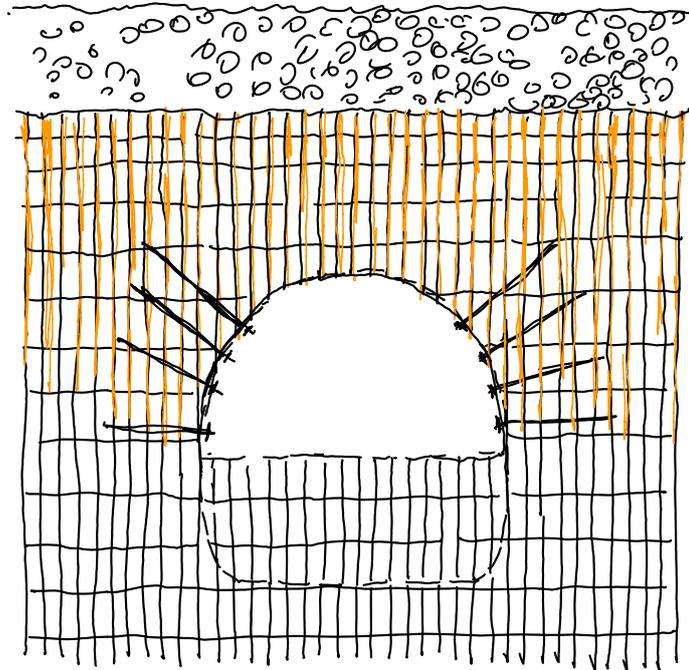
Applicable support concept (top heading with shotcrete lining and systematic rock bolting in the sidewalls).
